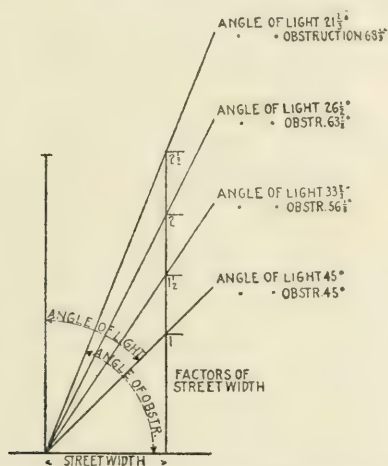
Angles of light and of light obstruction on ground floor on street front.
